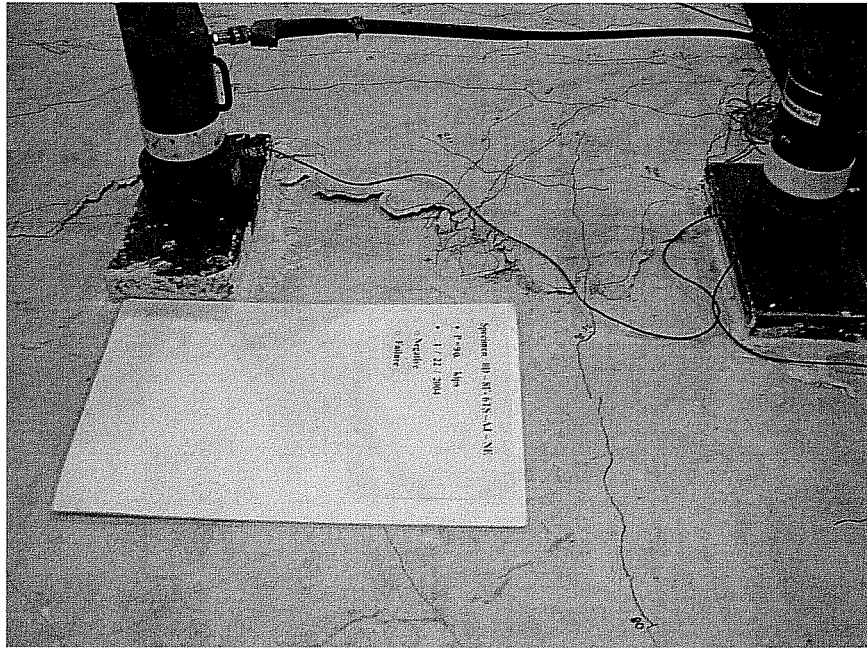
East exterior 8-ft bay failure at top of slab, facing west
